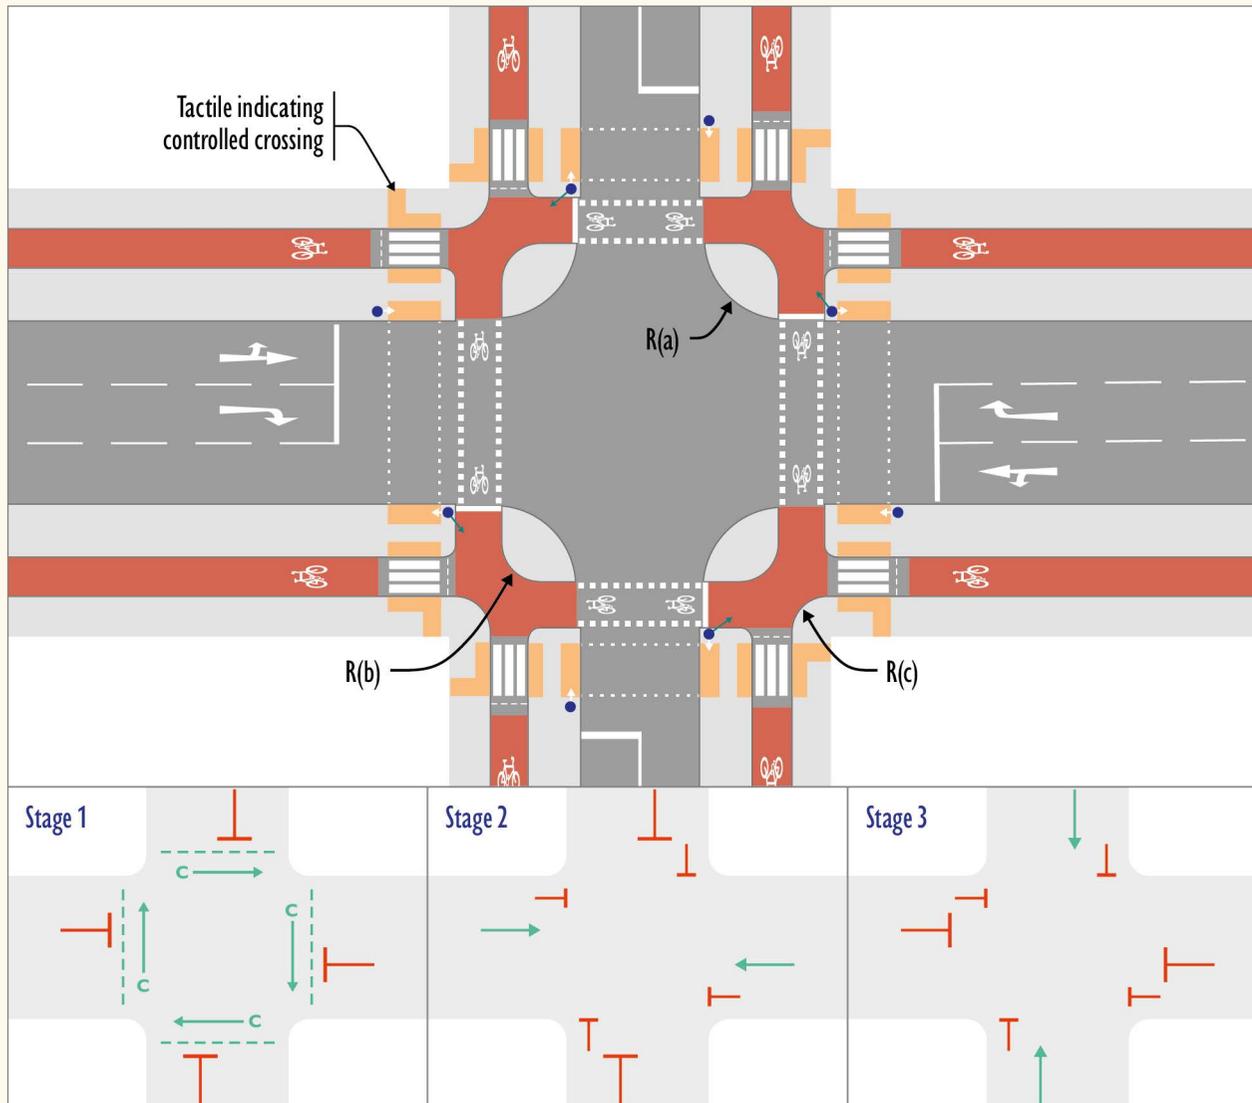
Protected signal-controlled junction layout with Zebra crossing of cycle track and typical staging arrangements
